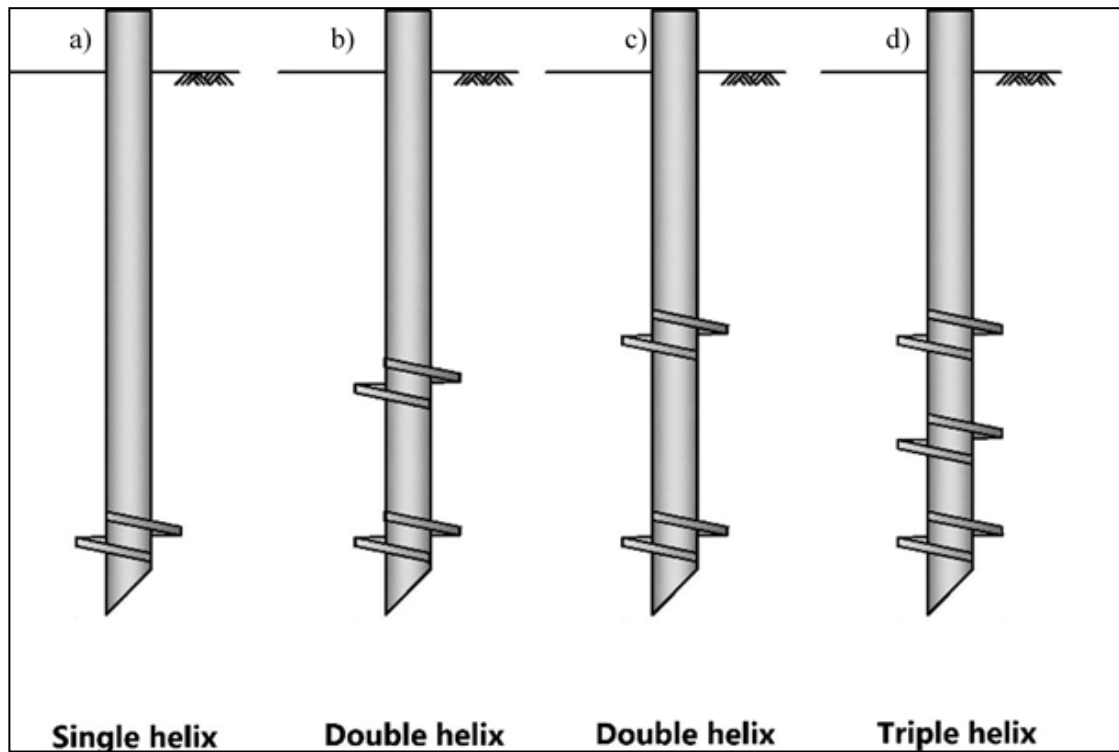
Examples for single and multiple helix anchors [Wang 2017]
